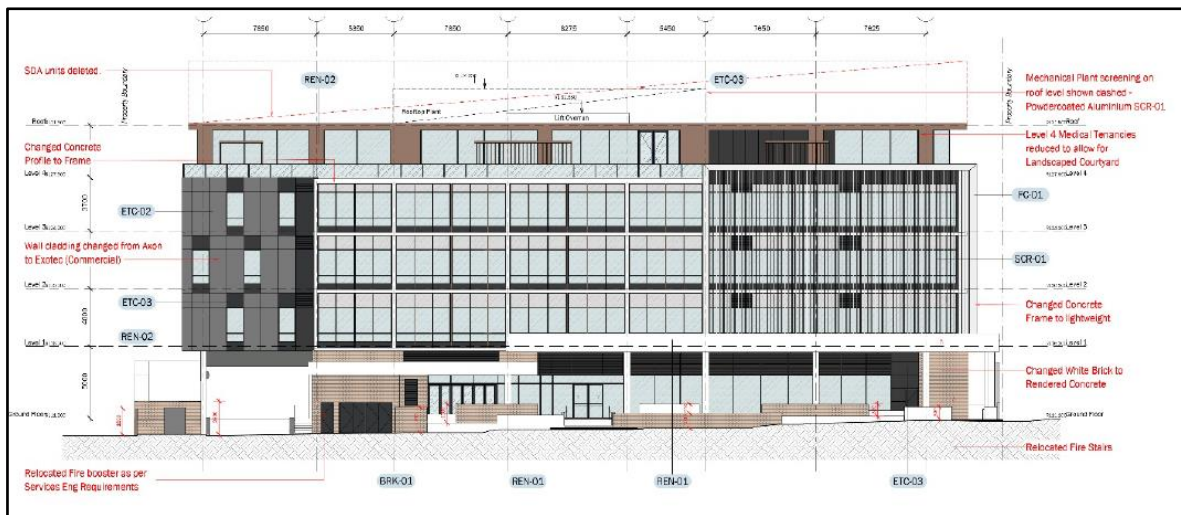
| Northern Elevation (Modification overlaid on Approved)
